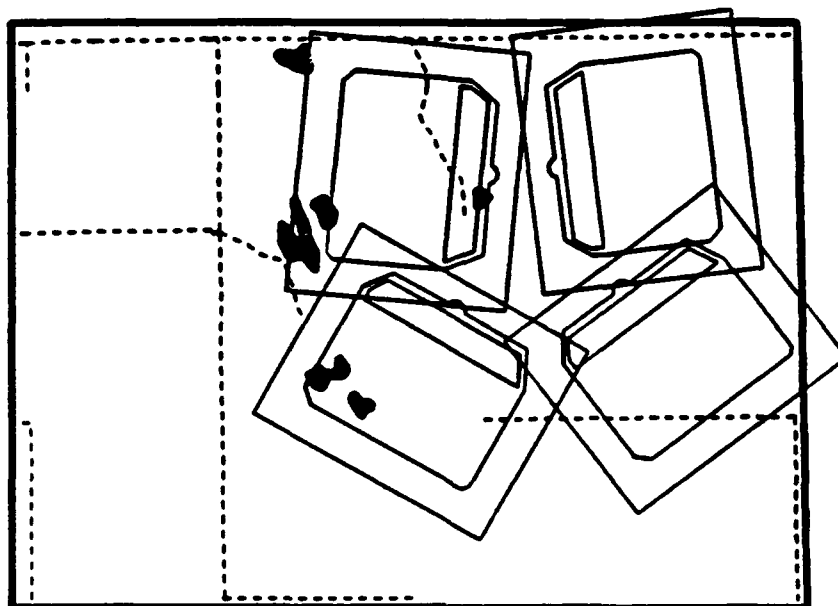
TX-NORTH PRELIMINARY SITE LAYOUT
